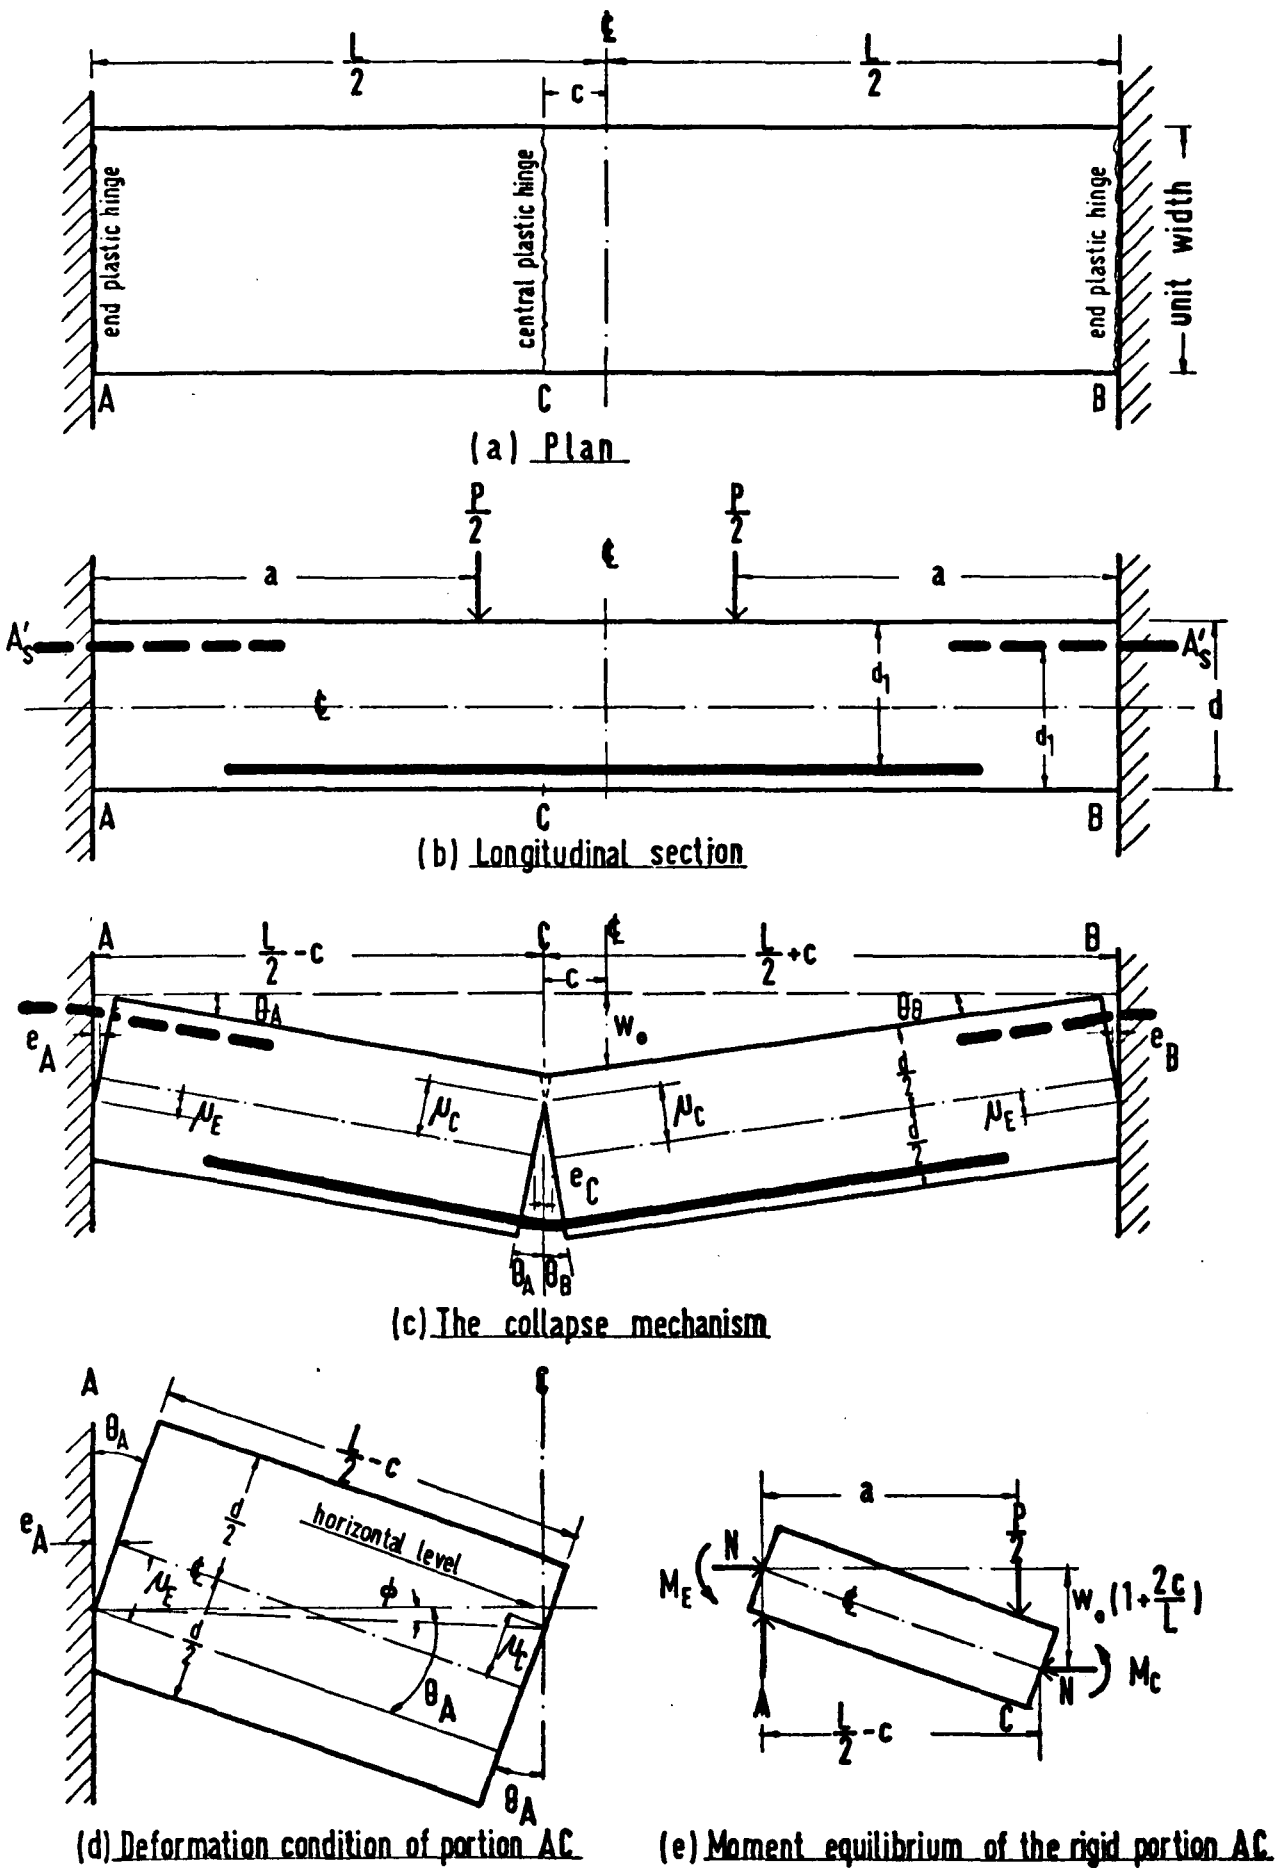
Axially Restrained Fixed Ended Reinforced Concrete Slab Strip with Two Point Loading At Yield
